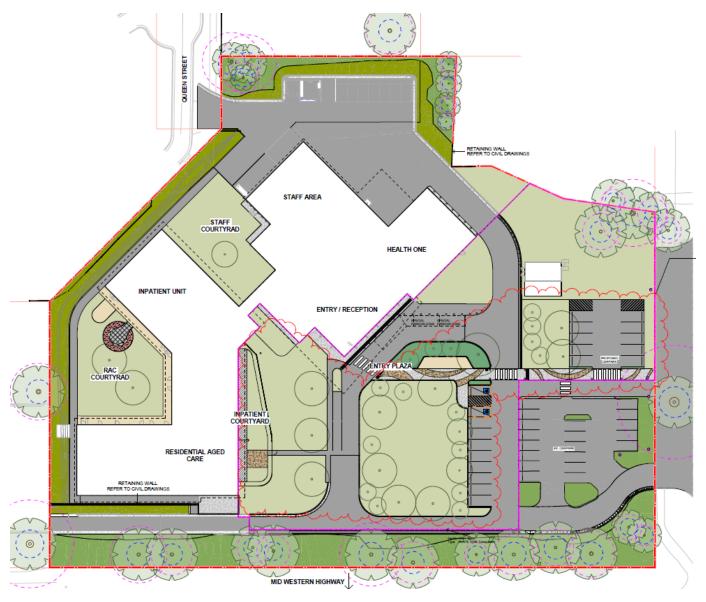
General Arrangement Plan showing the Proposed Amended site layout
